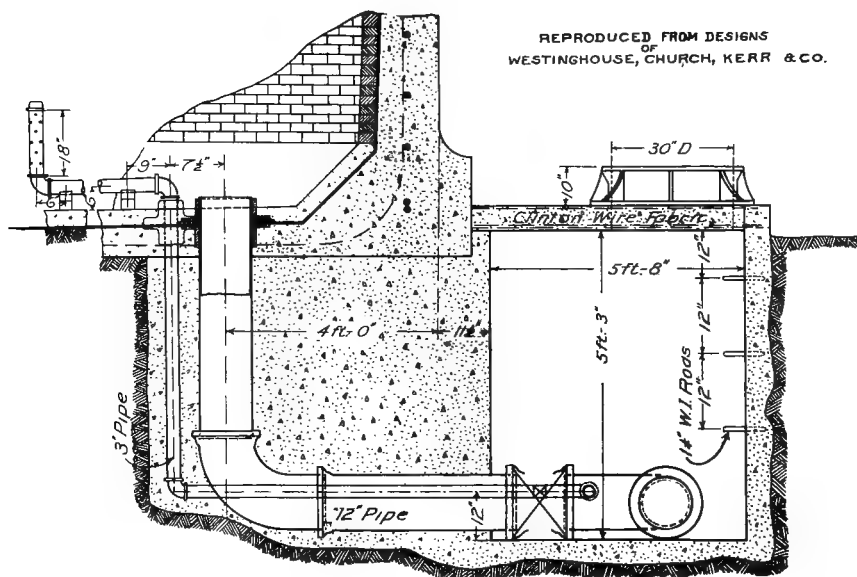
SECTION THROUGH VALVE CHAMBER, COS COB STORAGE RESERVOIR.
